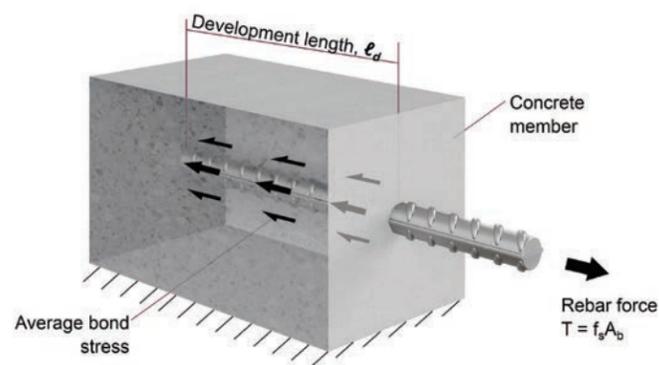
Bond stresses on a reinforcing bar.
